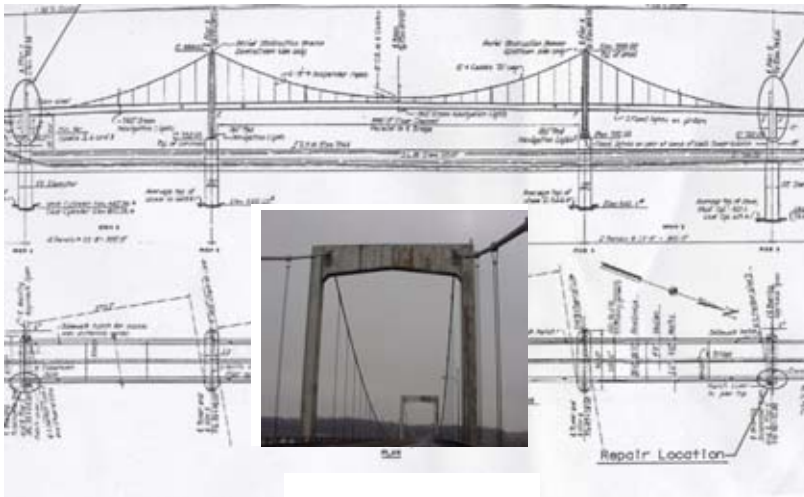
Overview of the Paseo Bridge (Elevation and Plan)
